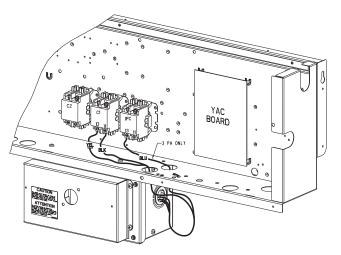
Location of HACR Circuit Breaker Enclosure
